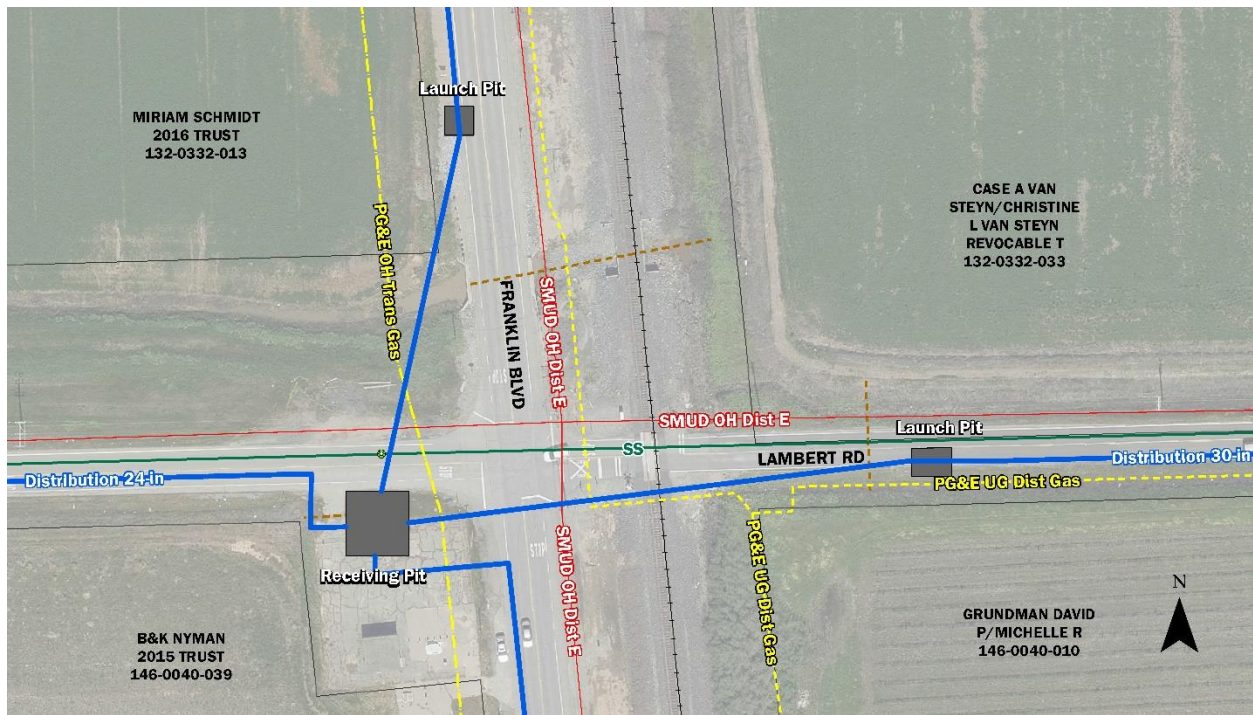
Proposed Trenchless Crossing of Lambert Canal at Franklin Boulevard and Franklin Bouelvard at Lambert Road
